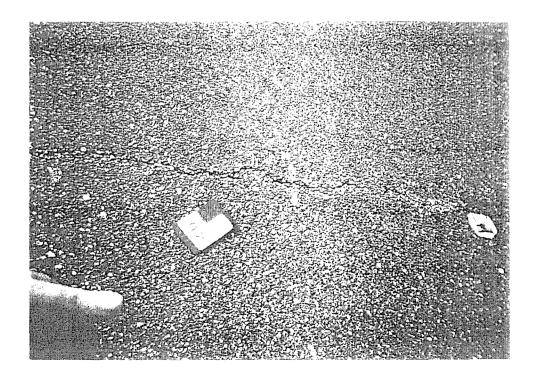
Crack of Photo 3.25 After Vacuum Blasting
